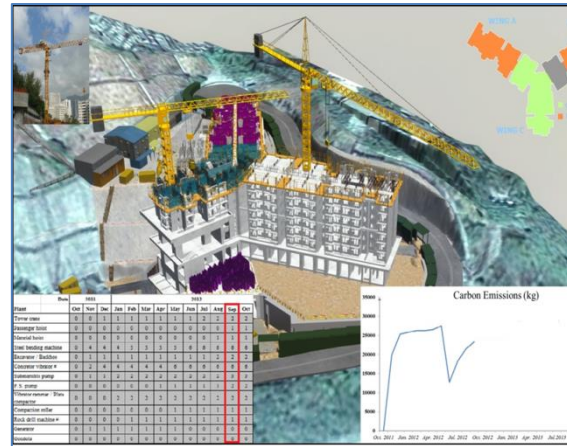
A visualisation of the estimated CO<sub>2</sub> emissions of the plant/equipment used in typical floor concreting work and the formwork installation stage
